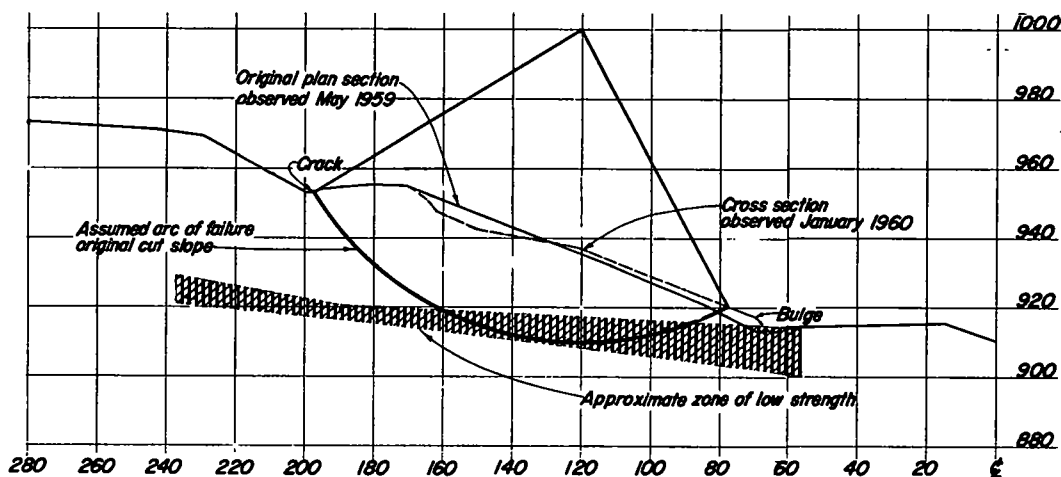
Cross-section of original cut, showing original plan section, failure section (including crack and bulge), zone of low strength, and approximated arc of failure.
